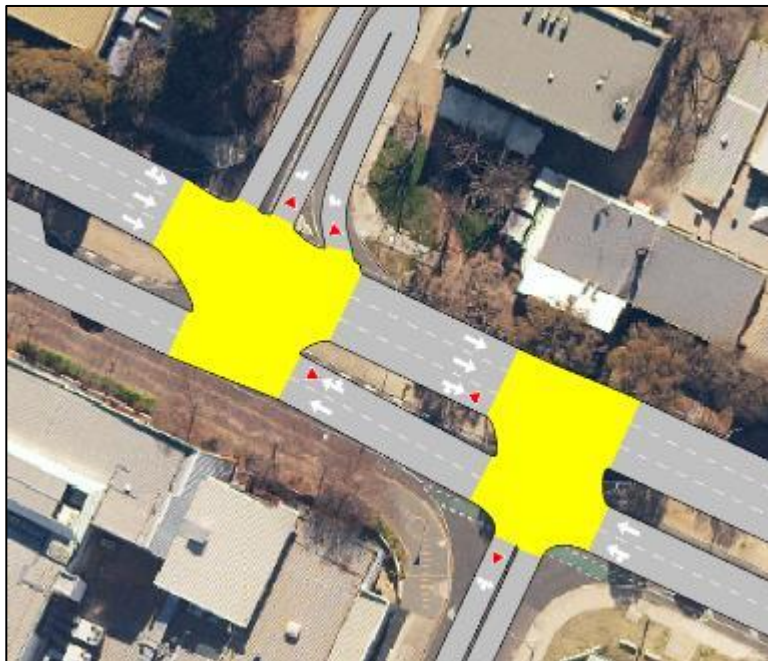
Existing Launceston Street /Furzer Street and Launceston Street / Irving Street layout
